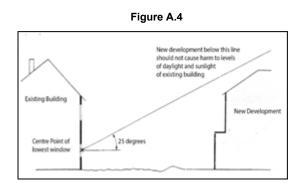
Section in plane perpendicular to the affected window wall from existing to proposed development showing acceptable application.
